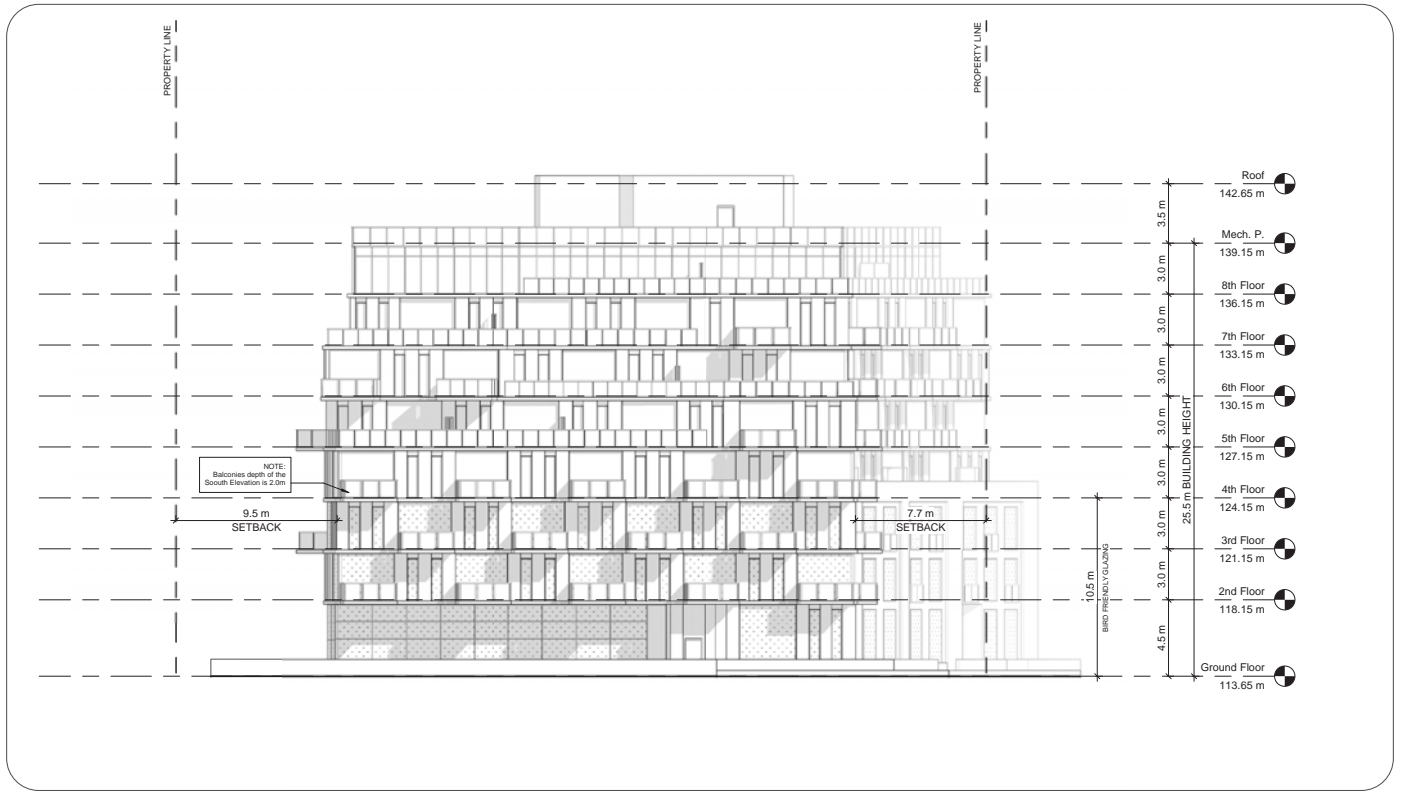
West Elevation, prepared by KFA Architects + Partners Inc.
